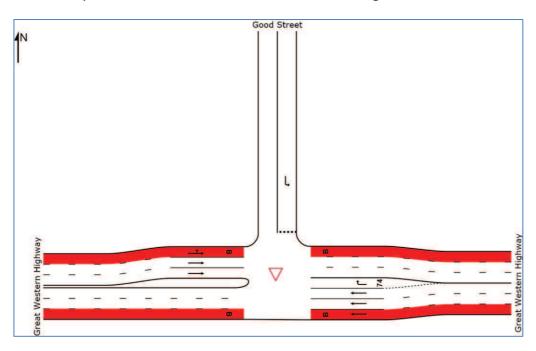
Great Western Highway / Good Street Intersection Layout
